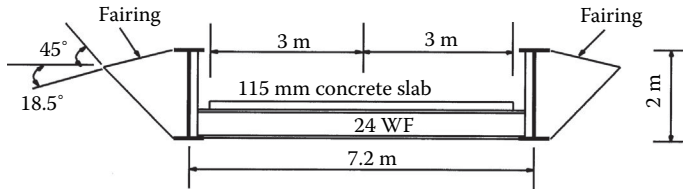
Deck section and fairings of Deer Isle Bridge.
